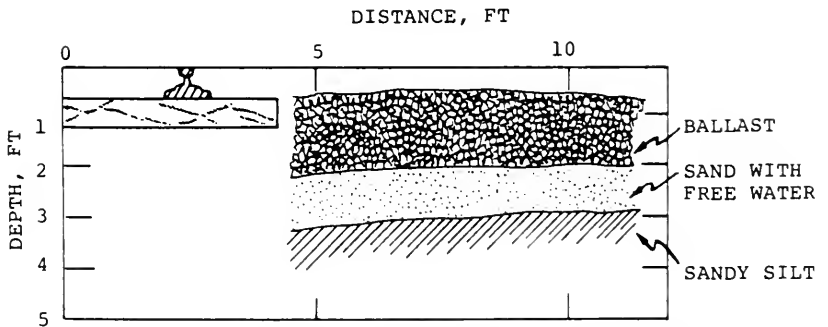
Transverse Cross Section at Site 1, Cross-Hole 2
